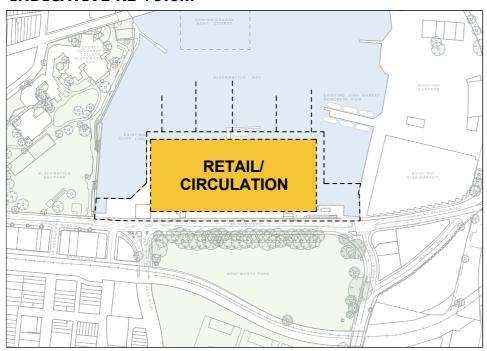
DETAILED BUILDING WORKS PROPOSALUSAGE PER LEVEL
